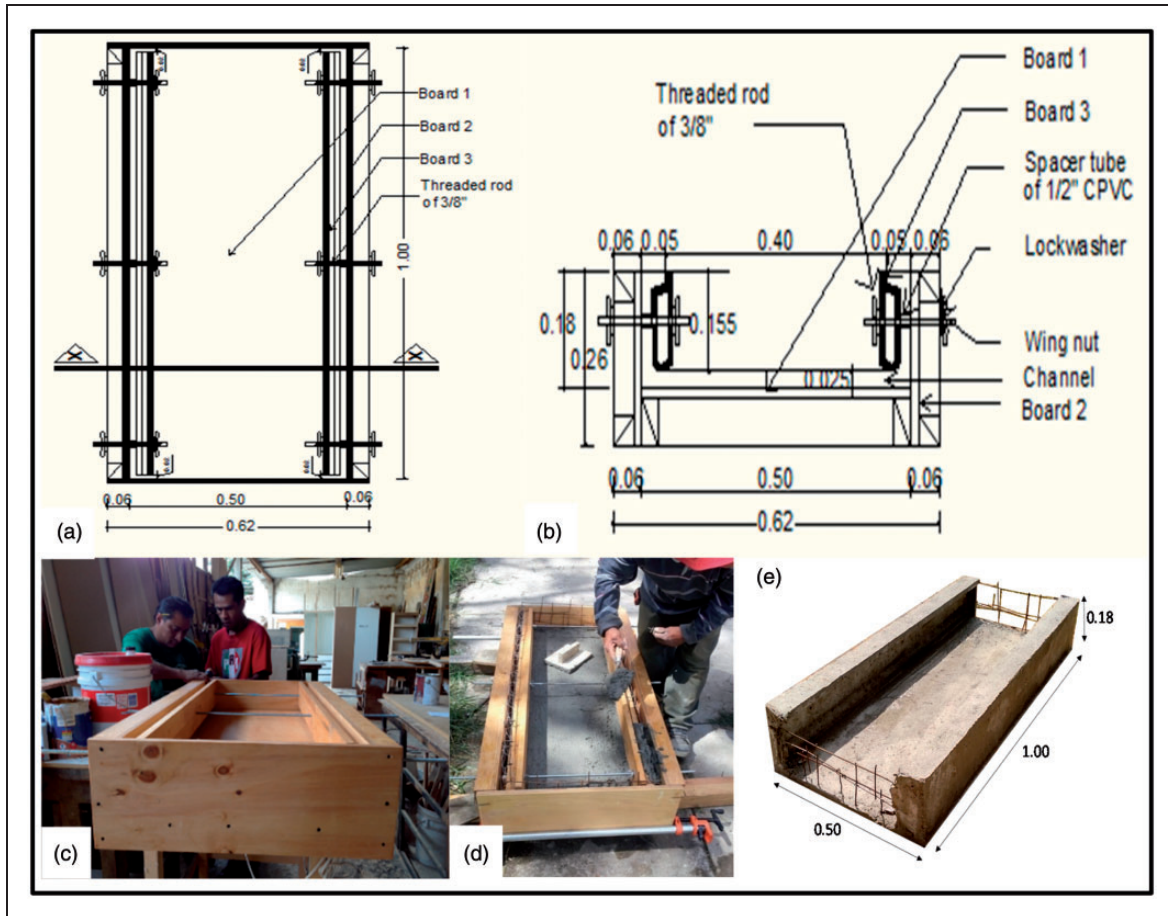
Drawings of formwork and fabrication of reinforced mortar channels: (a) architectural ground plan, (b) cross section and (c)–(e) wood formwork and finished channel.
